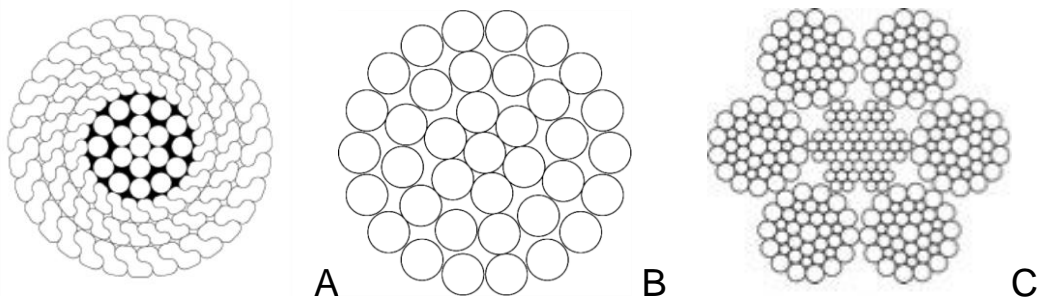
Section of typical cables: A-Full Locked Cable, B-Spiral Strand, C -Wire Rope.
